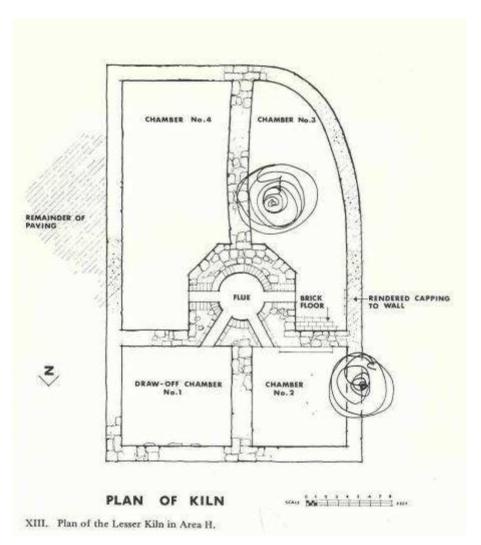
Plan of excavated Lesser Kiln - Culican and Taylor Plate Xiii p.45
